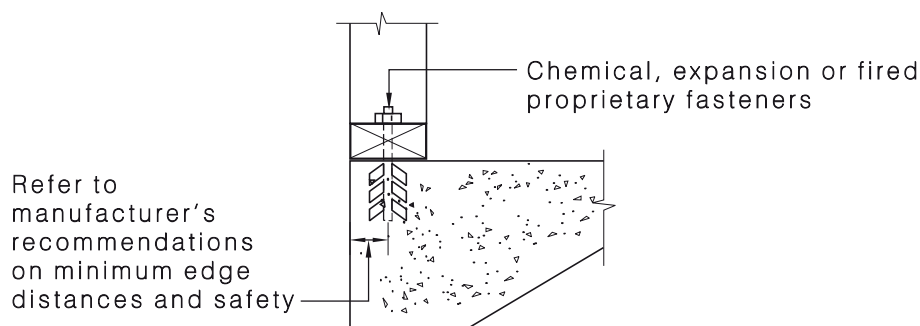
TYPICAL CONNECTION FOR TYPE B BRACING UNITS—
